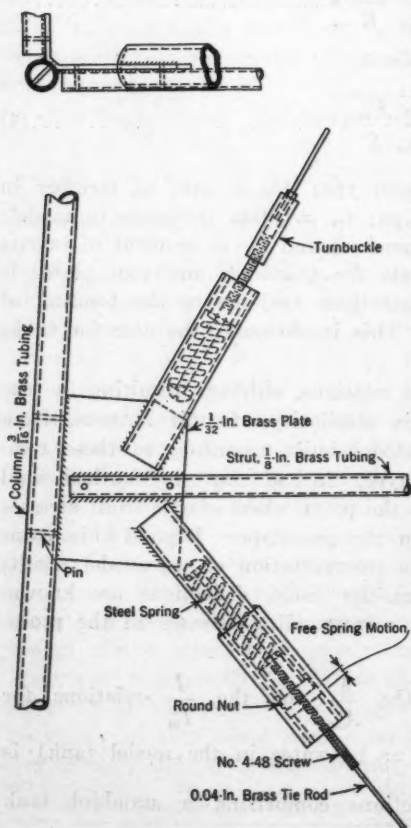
TYPICAL MODEL JOINT DETAIL
